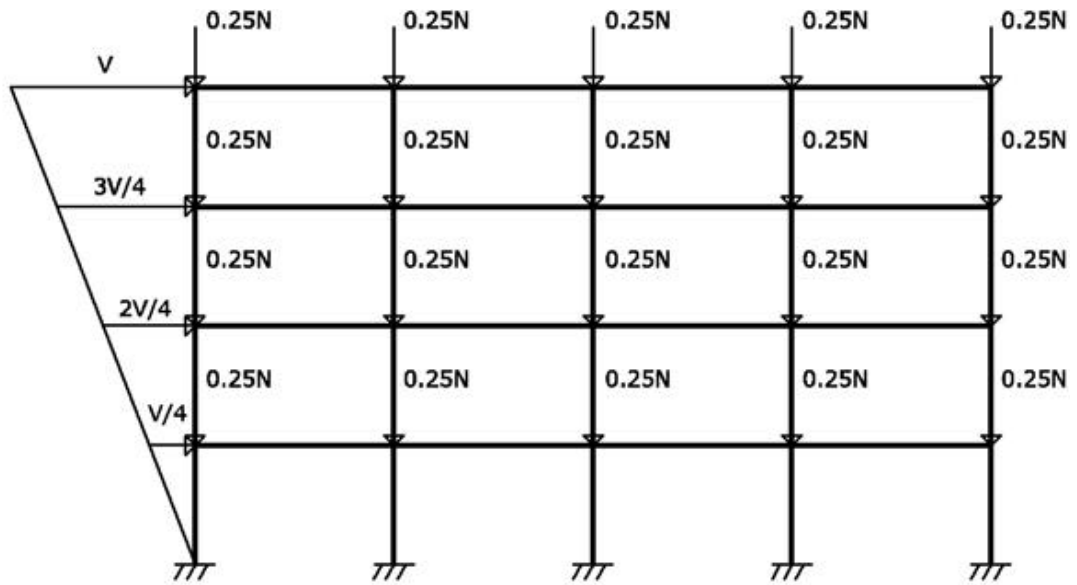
Profile of Lateral Force Applied on the Building Structure
